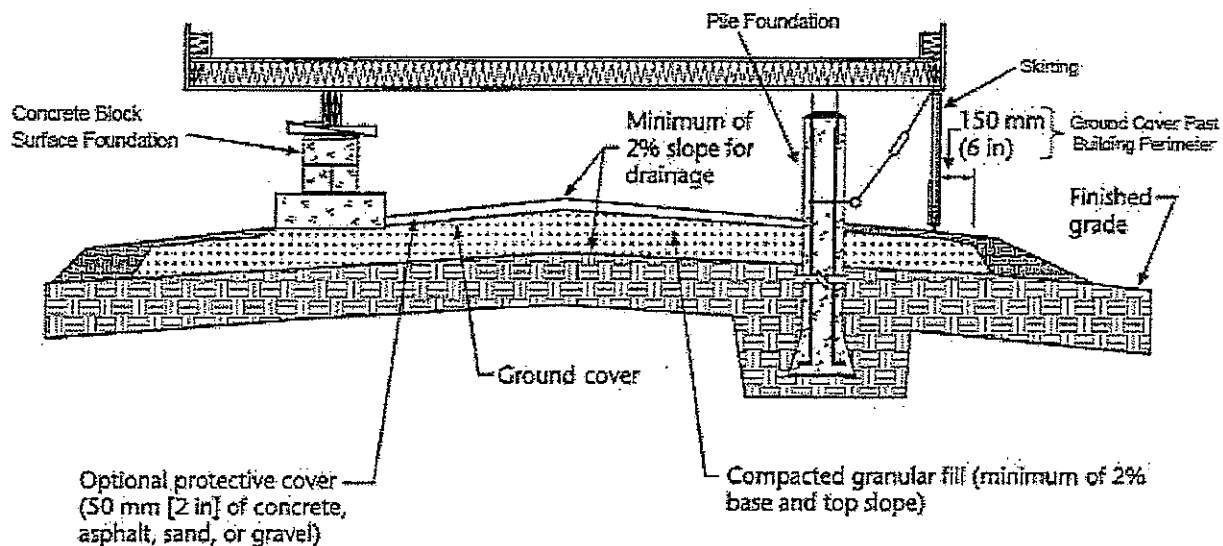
NOTE that a typical BLC will have more detail than this sample.
